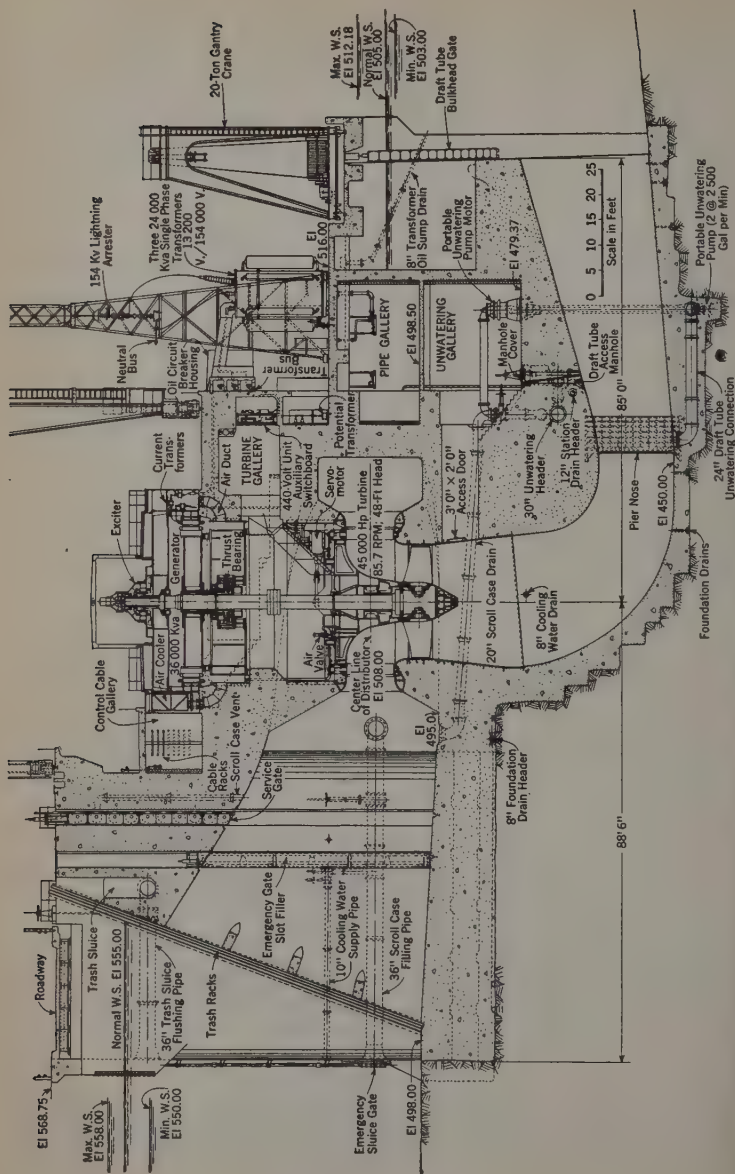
TYPICAL CROSS SECTIONS THROUGH WHEELER POWER PLANT
